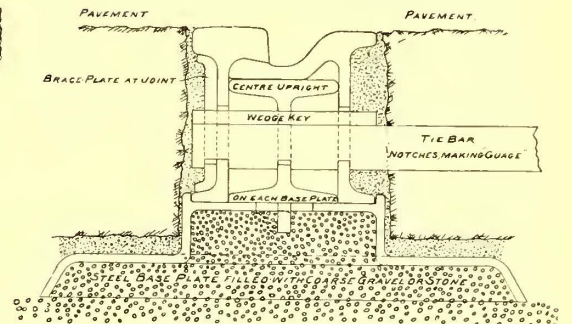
CROSS SECTION OF GIRDER RAIL AT BASE PLATE
